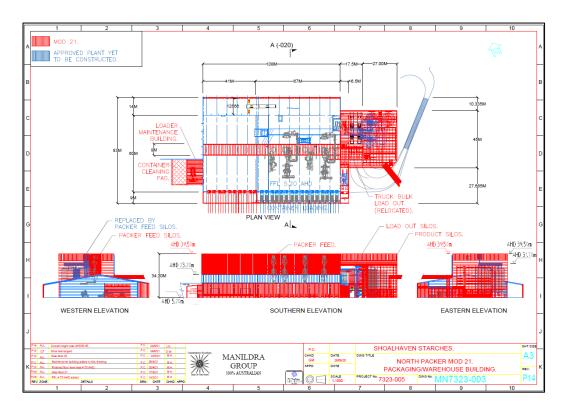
Plan and elevations of modifications proposed to Packing Plant.
